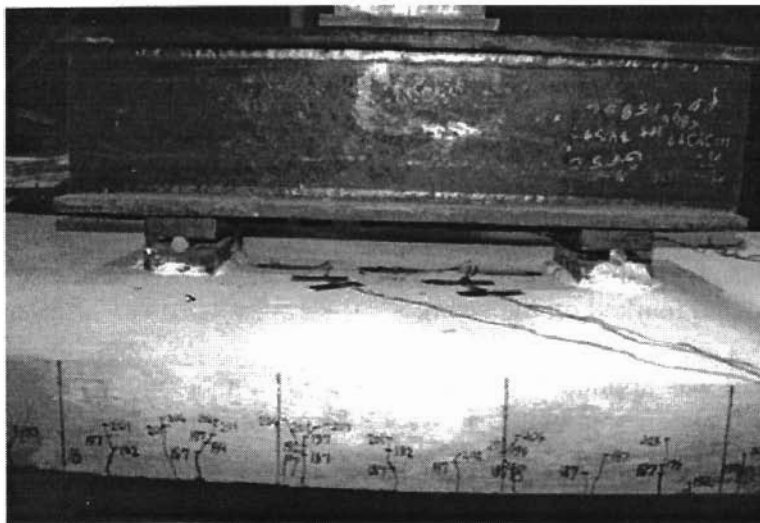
Load Bearing Plates, Rollers, and Spreader Beam
